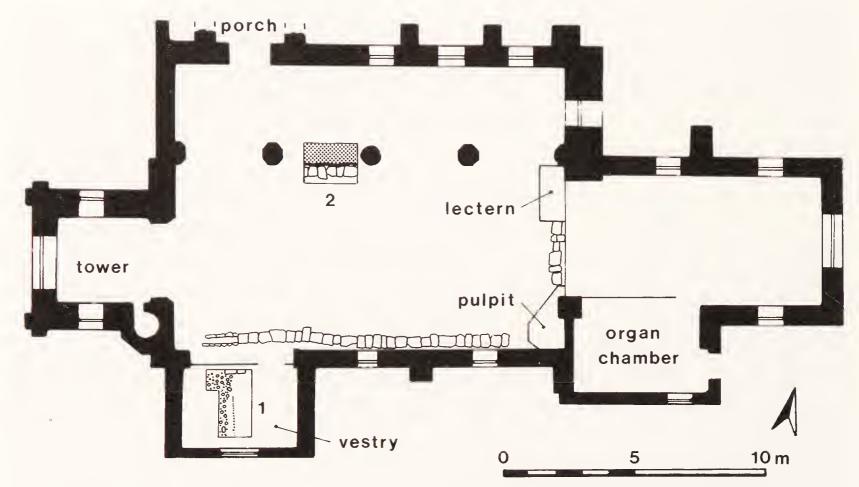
Plan of Ormesby Church showing position of trenches, excavated walls and channel.
